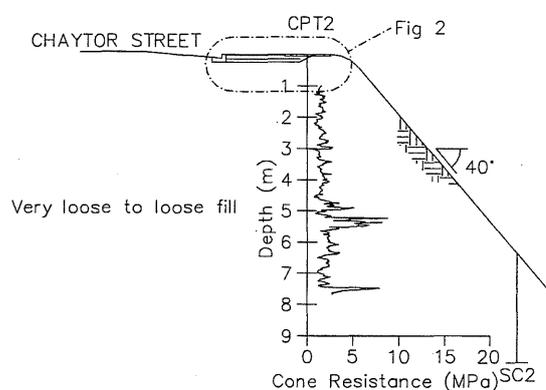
Chaytor Street Section 1 – Sub-surface conditions
